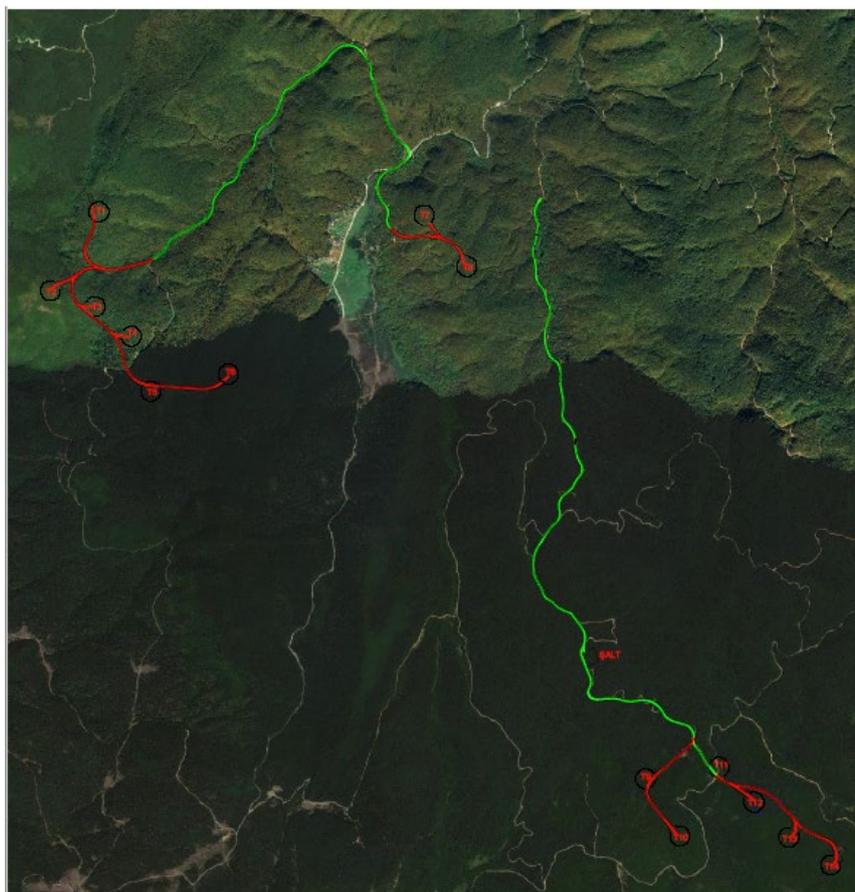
Project Site Roads Showing Turbines and the Switchyard (Şalt)
